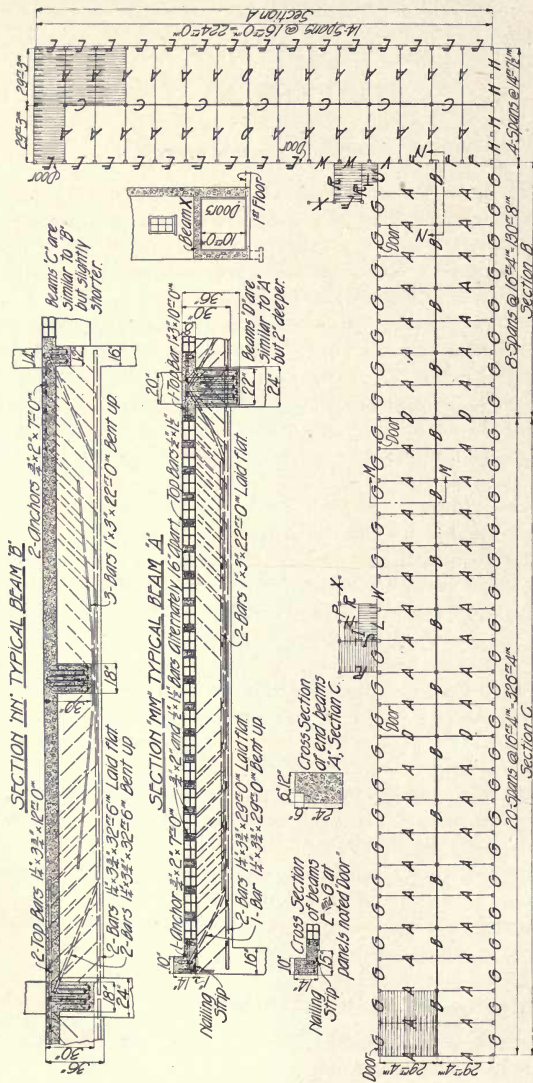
Floor Plan and Beam Details in Packard Factory. (See p. 131.)
